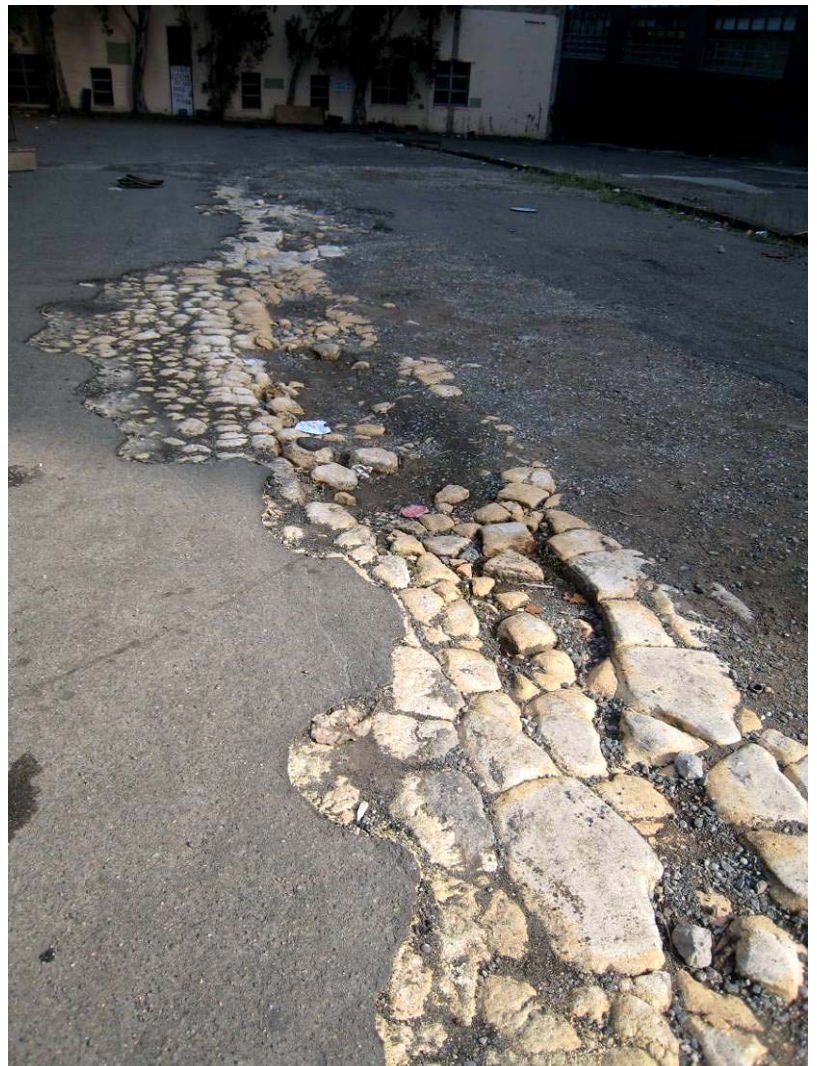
View showing sandstone cobbles and boulders at ground surface inside site.
